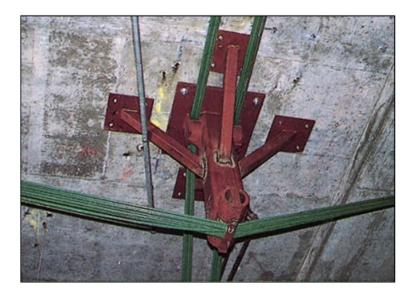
Arrangements of short saddle after installation of steel tendon (Repair &
